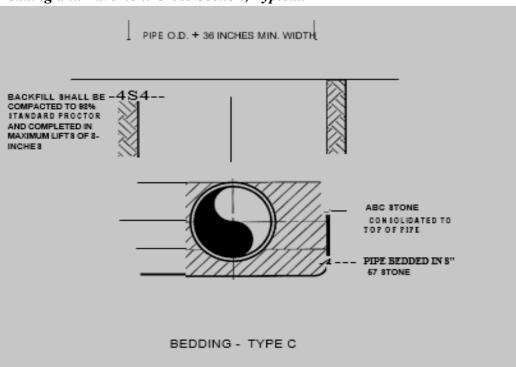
Pipe Bedding and Pavement Cross Section, Typical.
